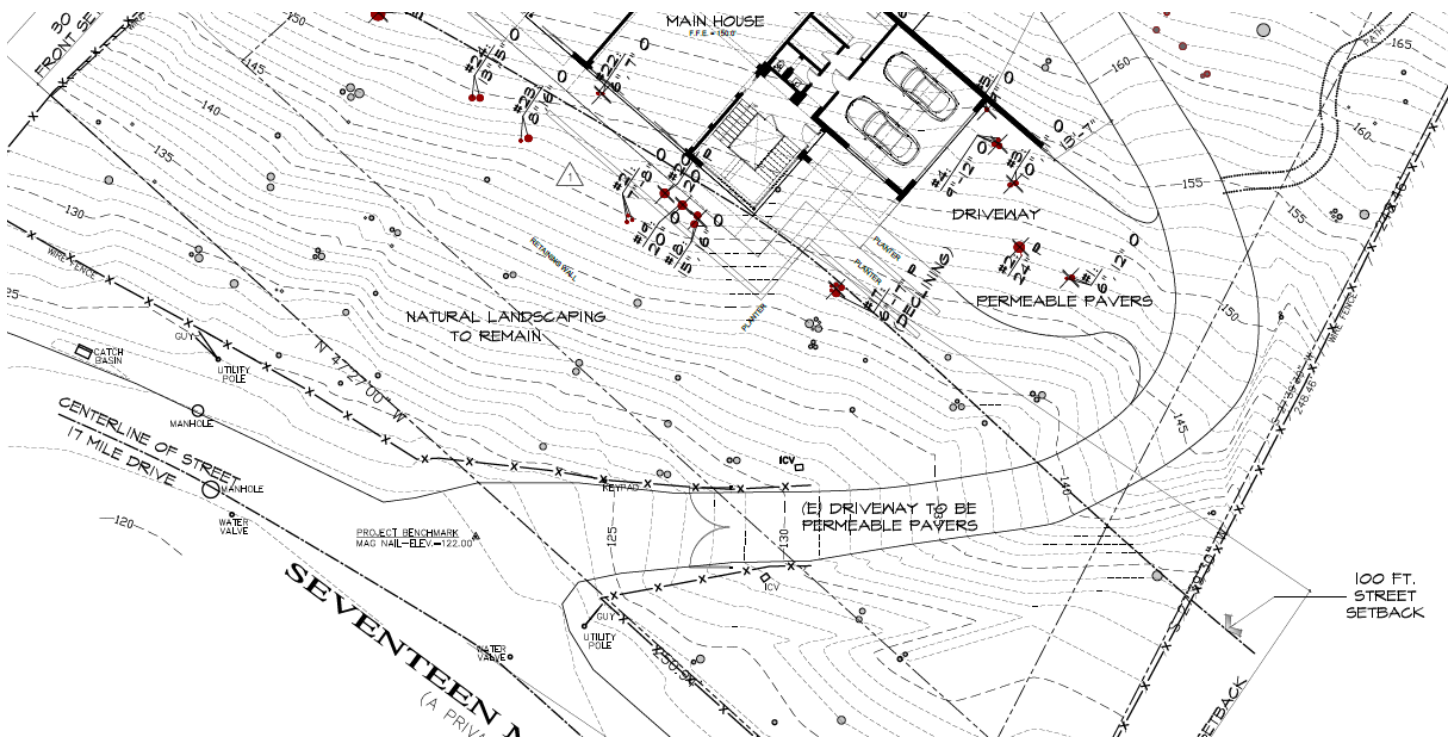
Portion of site plan with 100 foot setback from centerline of 17-Mile Drive
